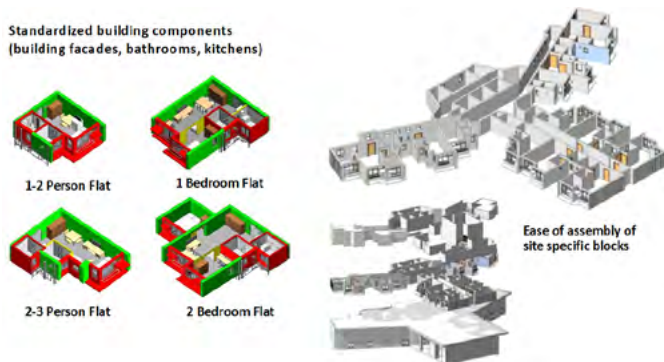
Application of BIM to generate modular flats, typical floor plans and buildings
